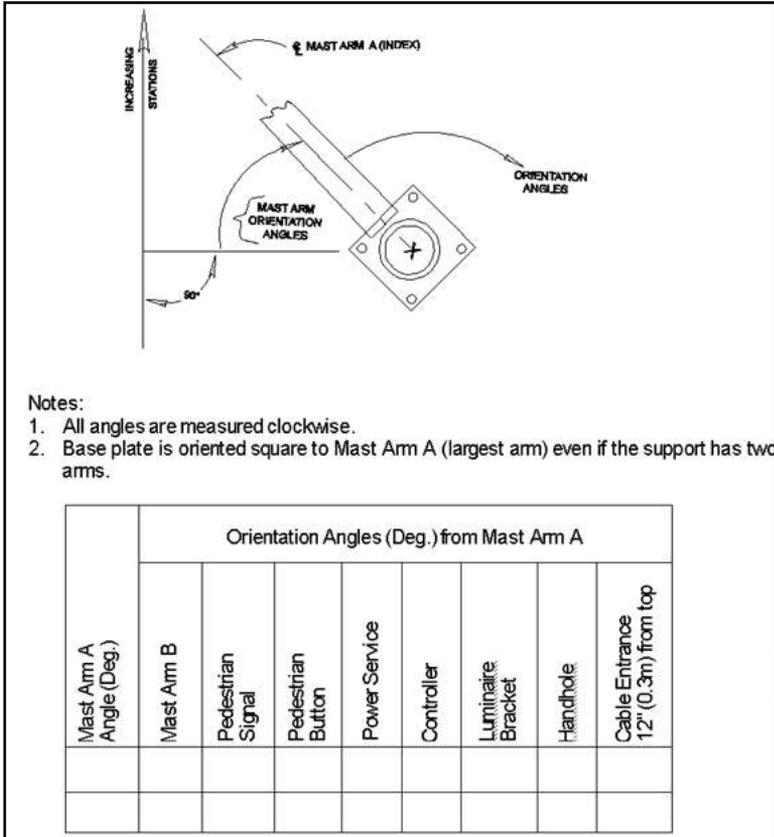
Plan Details for Signal Supports - Mast Arm Orientation (table continued from Figure 498-37)
